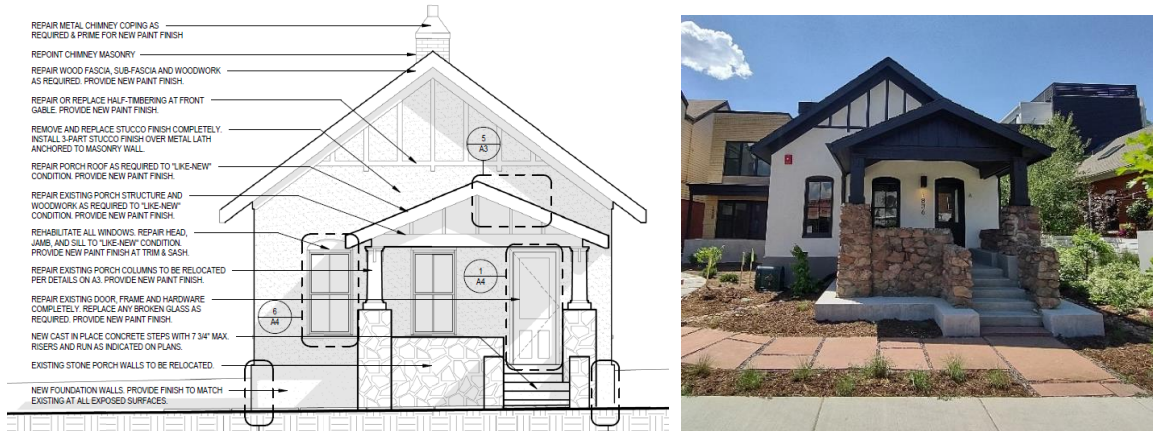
Left: Rehabilitation plan for façade, including repair of chimney, half timbering, porch, stucco finish, windows and door. Right: Rehabilitated house on new foundation on site showing relocated porch at facade, rehabilitated windows, stucco and chimney.
